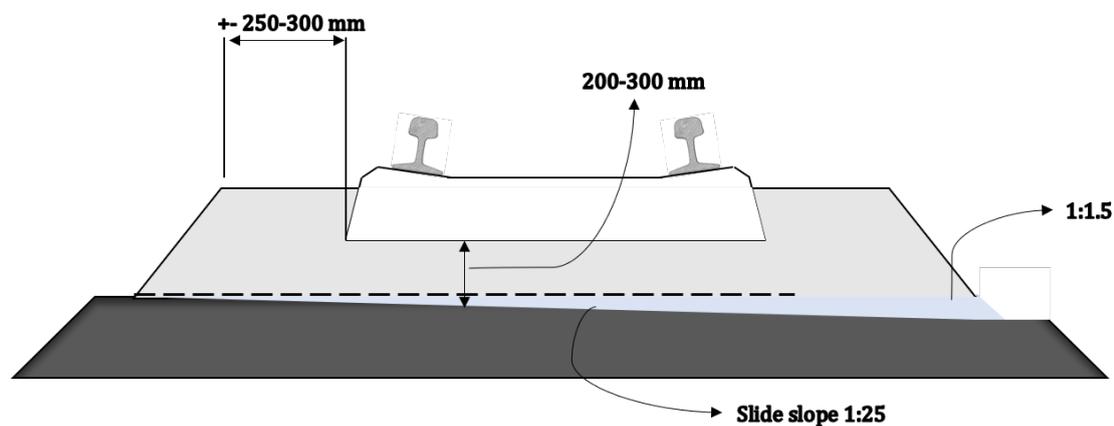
Ballast bed profile (adapted from Zaayman (2017))
